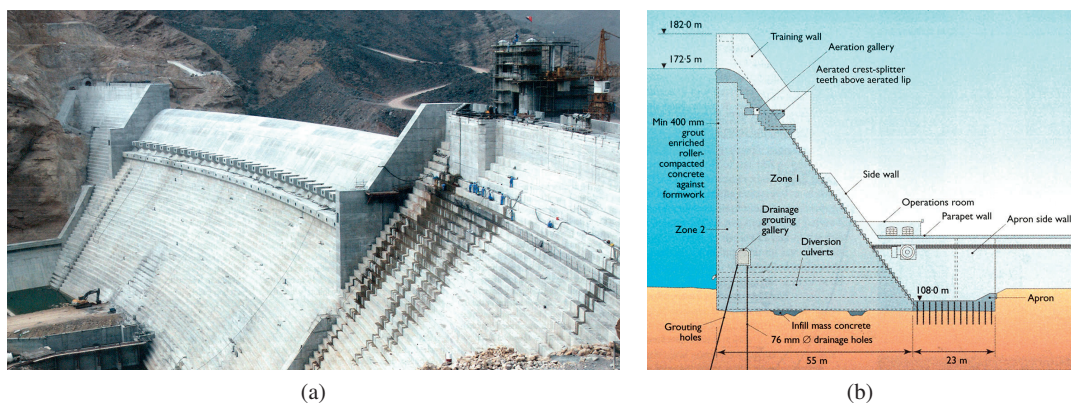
Wadi Dayqah dam (a) construction photo (Prisk et al. 2009), (b) spillway section (Prisk et al. 2009)
